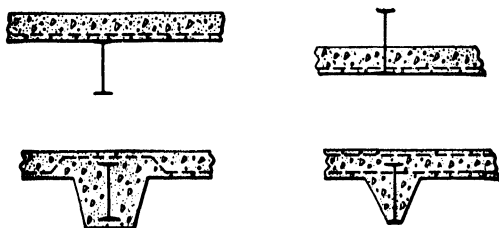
Methods of supporting concrete slabs on steel beams.
